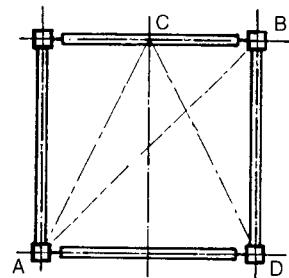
Quadrangular box girder as a combination of two lateral single plane girders
